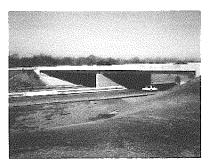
I-90 Exit 54 Interchange Overpass
